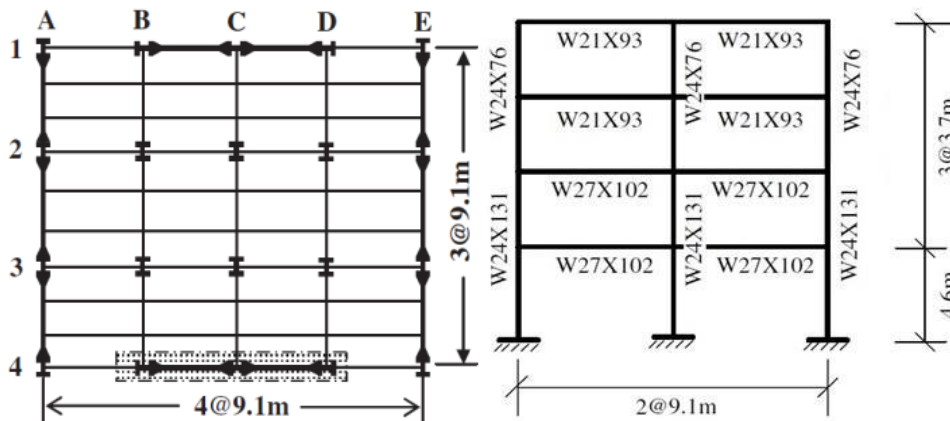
Details of the frame of the building plan and the frame selected for modeling in the laboratory [۱۷]
